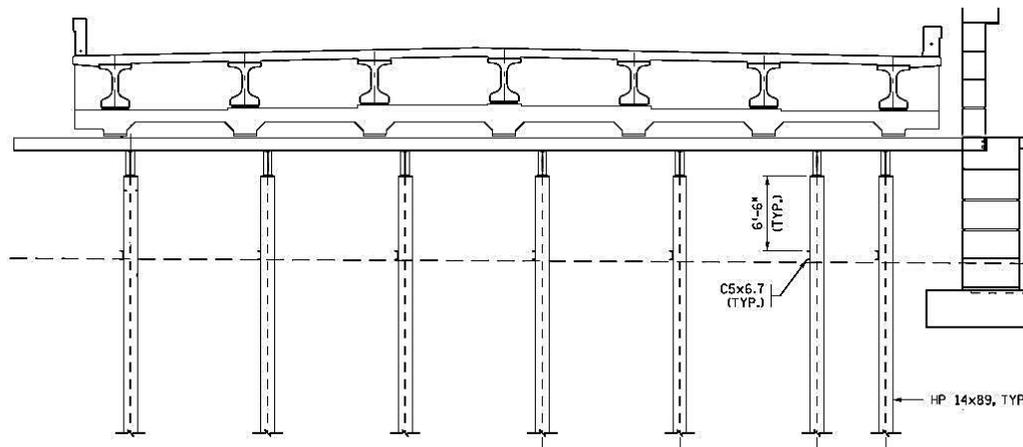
Side view of the Larpenteur Ave temporary abutment substructure
